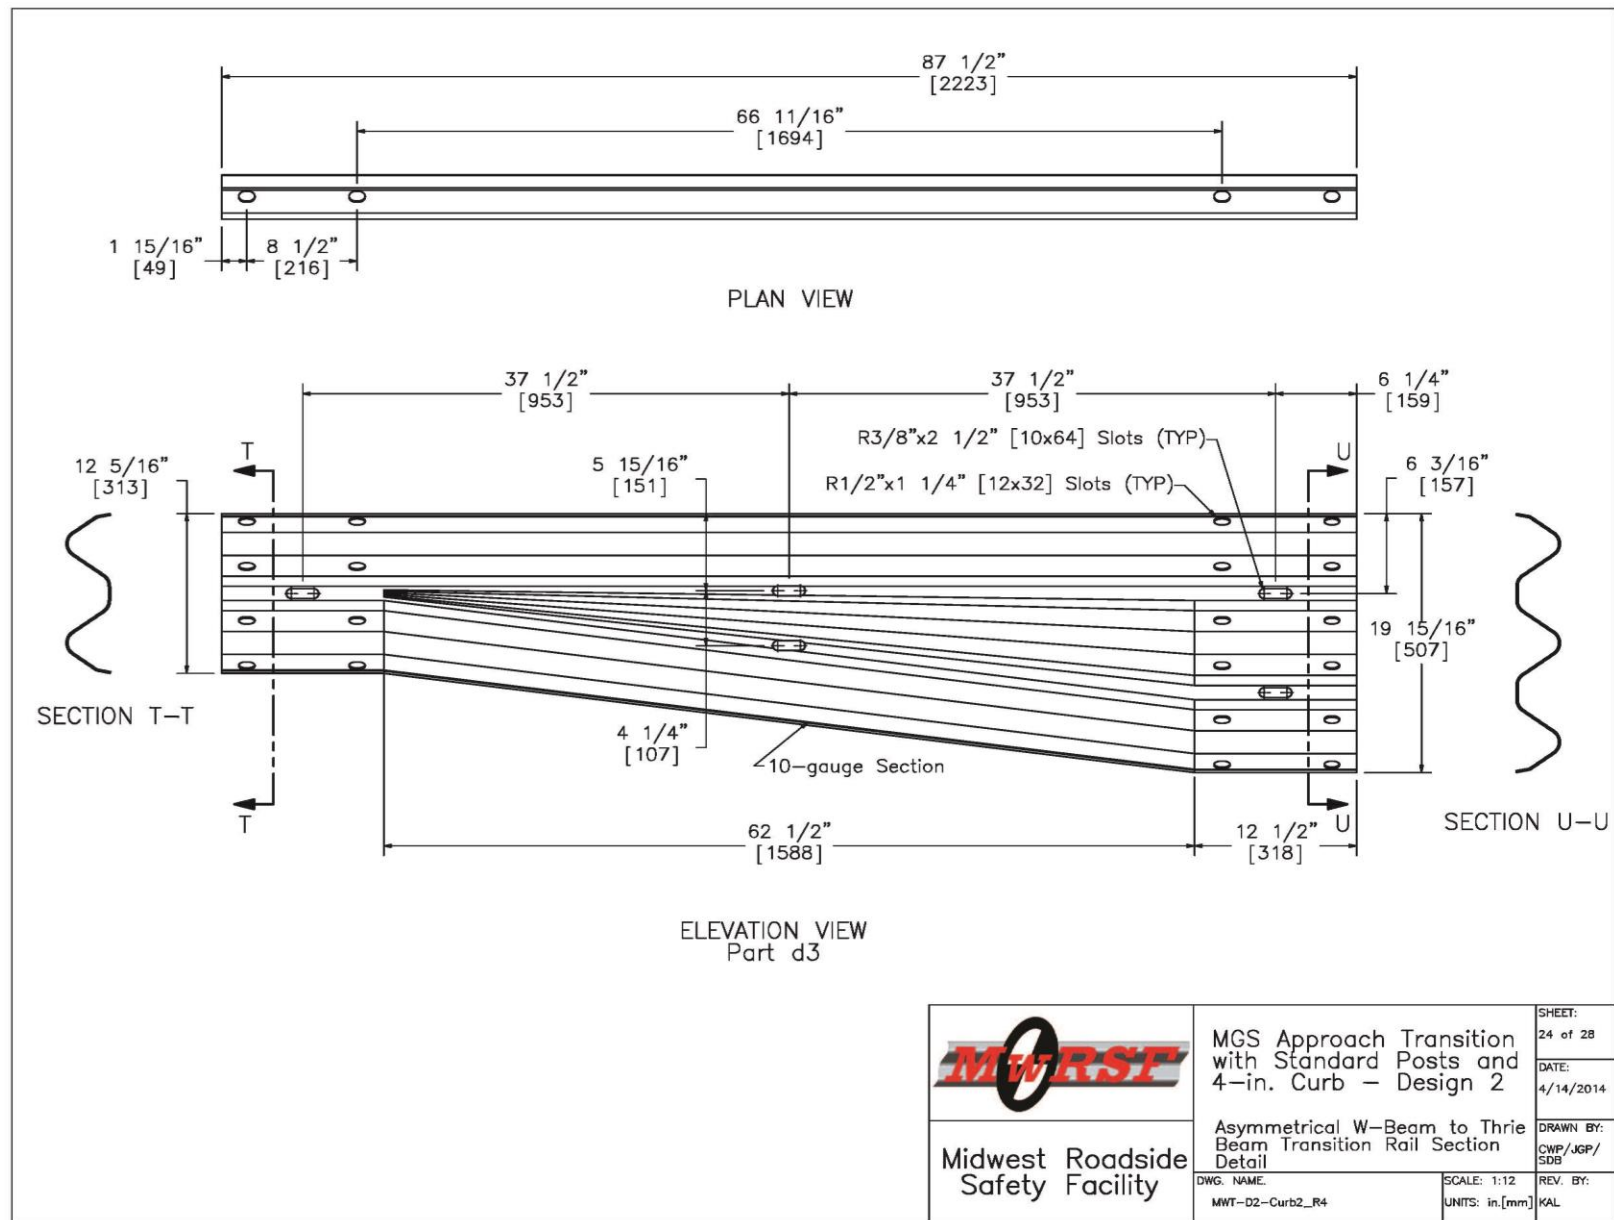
Asymmetrical W-Beam to Thrie Beam Transition Rail Section Detail, Test Nos. MWTC-2 and MWTC-3
